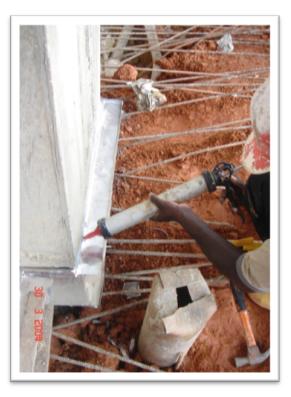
ARMOUR-THOR construction joint. NOVITHOR Flexi-Gel being applied to the v-joint in the ARMOUR-THOR.
